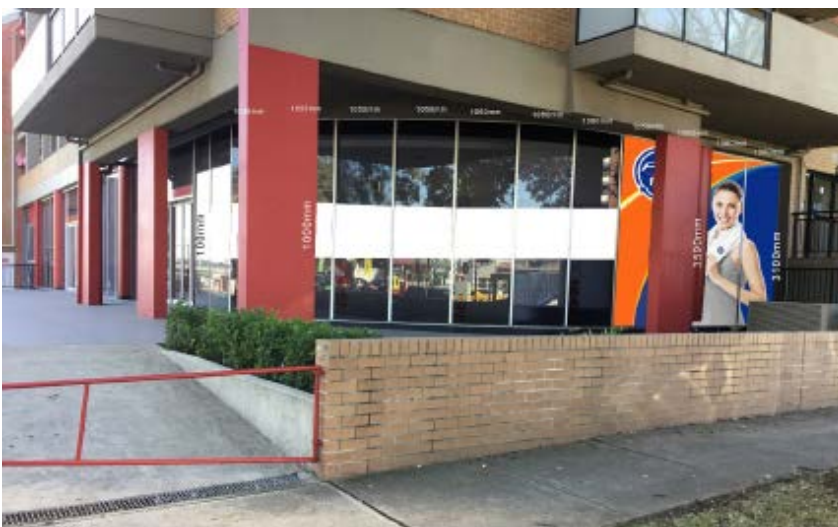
Proposed signage on windows of board room, training and office as viewed from Hillcrest Street.
